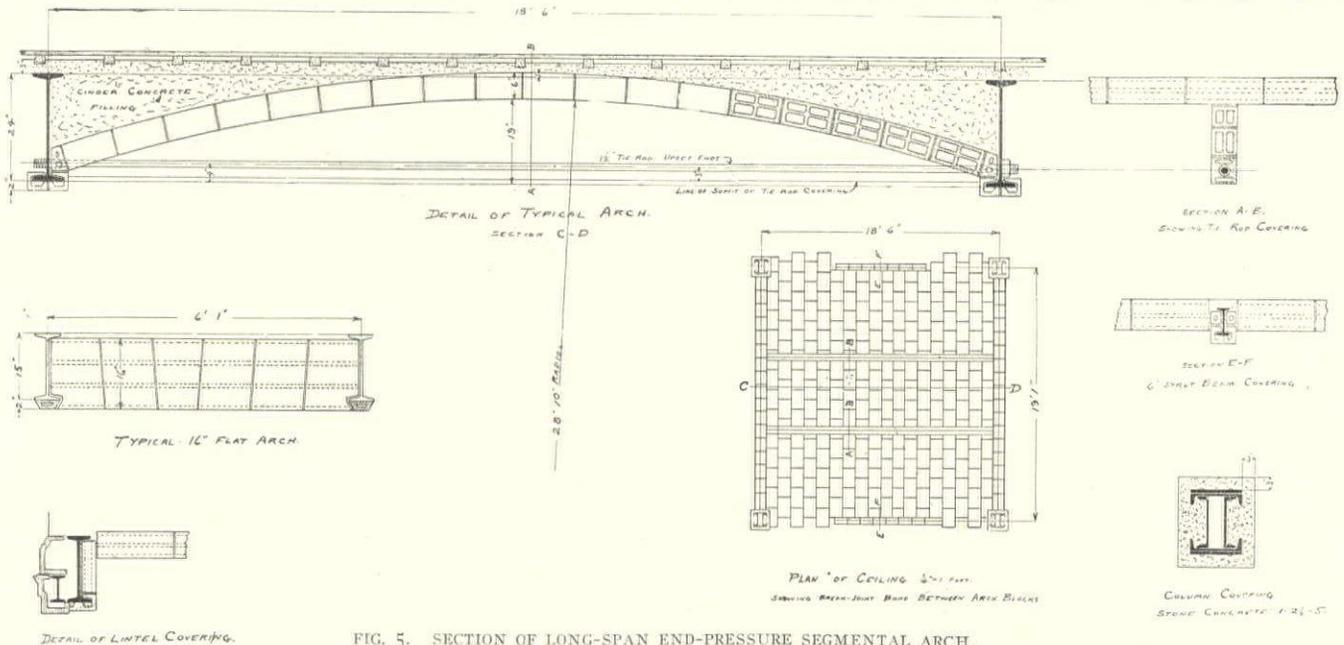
SECTION OF LONG-SPAN END-PRESSURE SEGMENTAL ARCH, WITH DETAILS; BROWN BLOCK, ST. LOUIS, MO.
